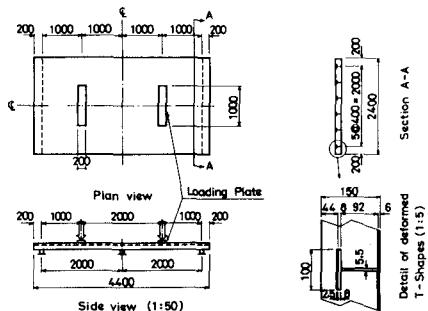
Dimensions and loading arrangement of continuous composite slab
